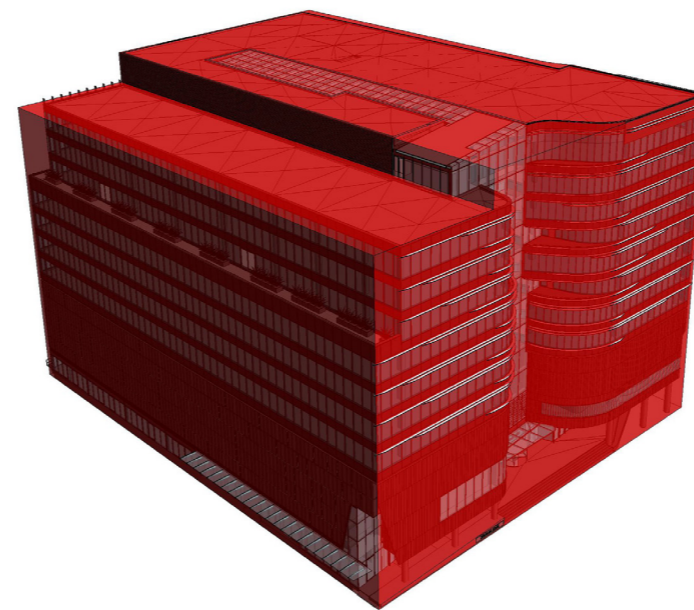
Parameter Plan envelope overlay. Aerial view at south east corner.
